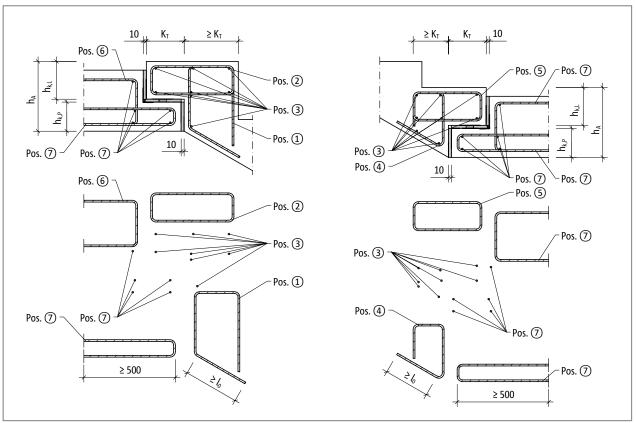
Schöck Tronsole® type F: On-site reinforcement with superelevated connection
